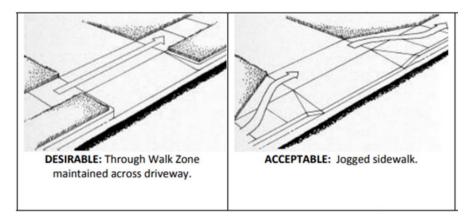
Walk Zones through Driveway Connection Areas (Source FHWA Accessible Sidewalks and Street Crossings)
